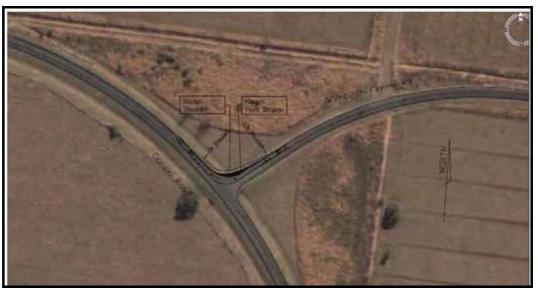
Proposed Intersection treatment for Coraki Road - Wyrallah Ferry Road (source: RoadNet, 2009)
